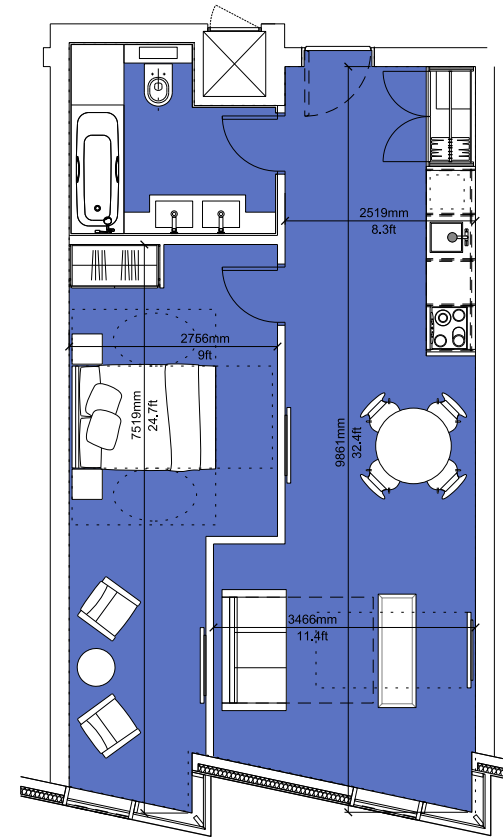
Twenty-first floor plan of the serviced apartment tower
